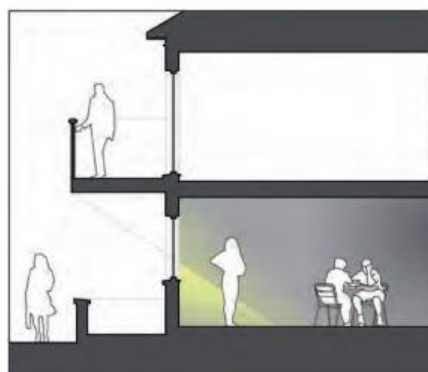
Balconies and projecting access ways can restrict daylight to rooms lit by windows below them
